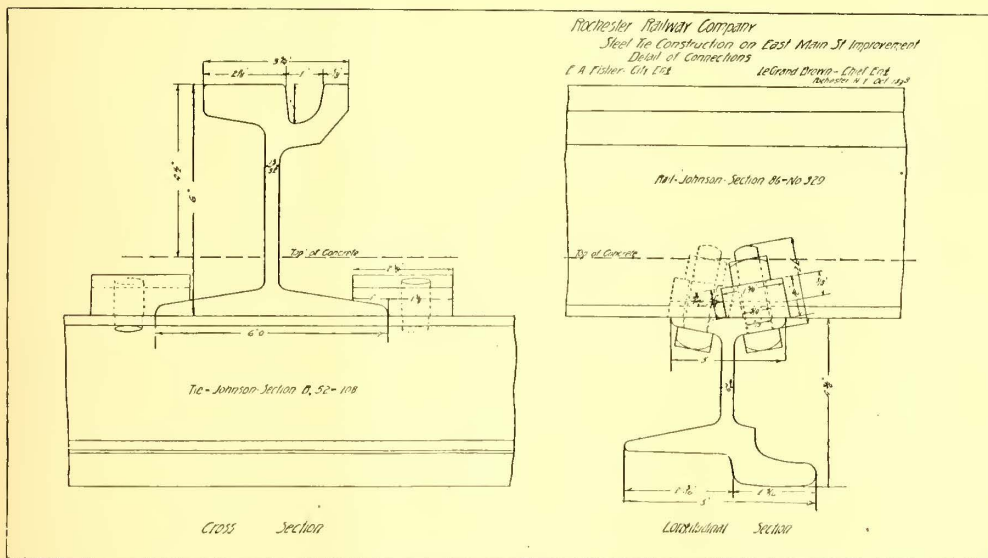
STEEL TIE CONSTRUCTION ON EAST MAIN STREET
